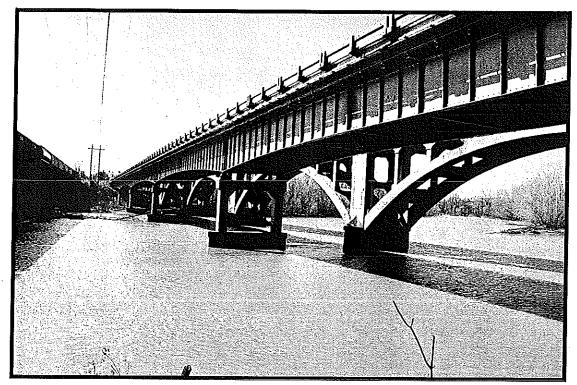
Looking southwest at downstream elevation of US 29/70 Bridge No. 2; spandrel arches of Wilcox Bridge to right and North Carolina Railroad bridges to far left.
